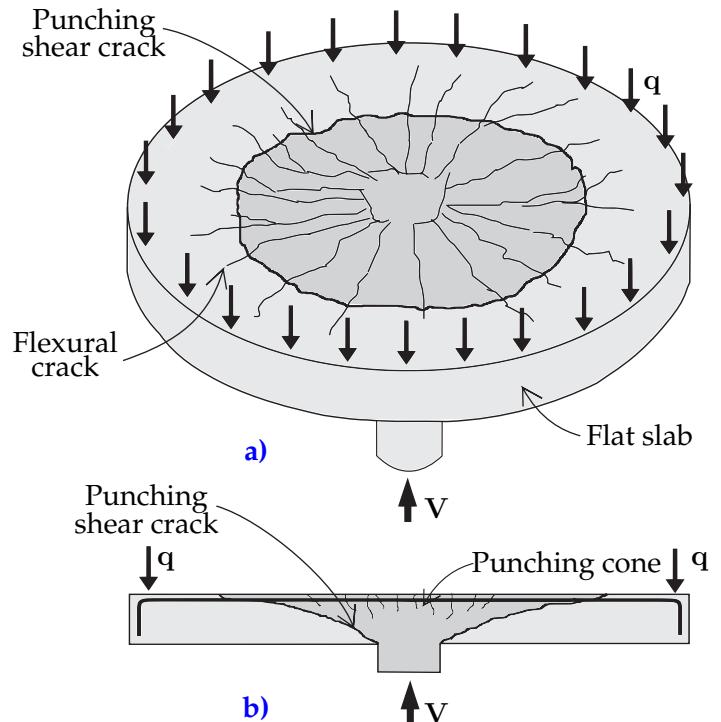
Isolated interior flat slab-column connection region and typical punching shear failure surface, adapted from [Bompa and Onet \(2015\)](#): a) Isometric view; b) Section view.
